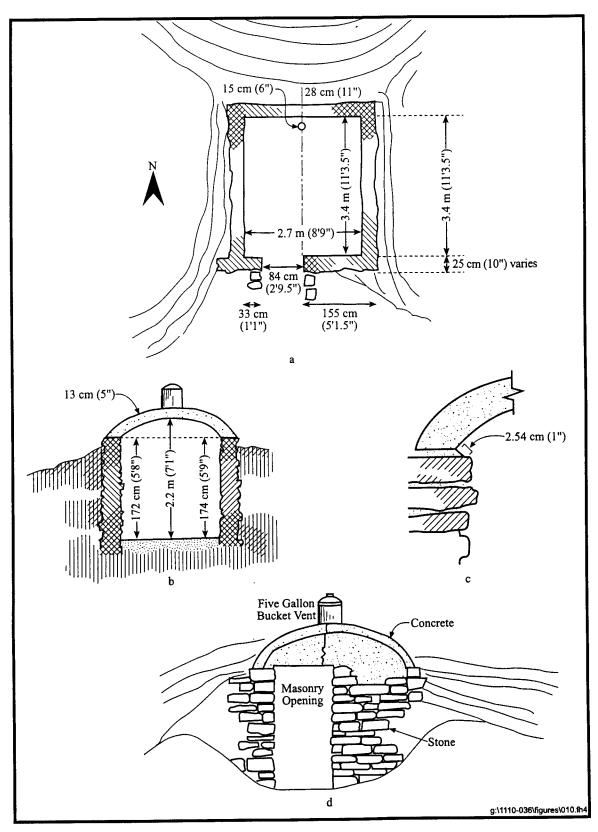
Views of the storm shelter at site 34Cm-488: (a) plan view; (b) cross section; (c) detail, head of wall section; (d) profile, south wall.
